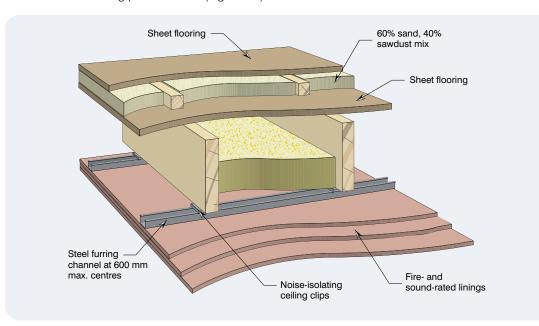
Adding mass to floor system through the use of sand top layer.
